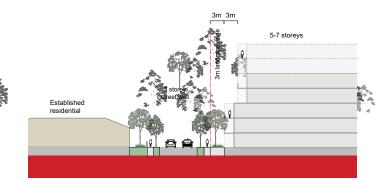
Roseberry Avenue, Civic Precinct. A 3m ground floor setback is proposed to respond to the landscaped character of the precinct and street.
